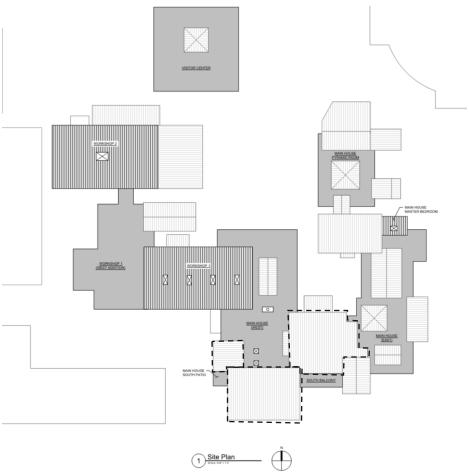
Site plan with flat roofs and metal roofs to be replaced labeled by location. Flat roofs to be replaced are shaded gray and metal roofs to be replaced include black lines representing metal seams. Three potential alternate additional roofs are shown with a dashed boundary line related to poor insulative performance.
